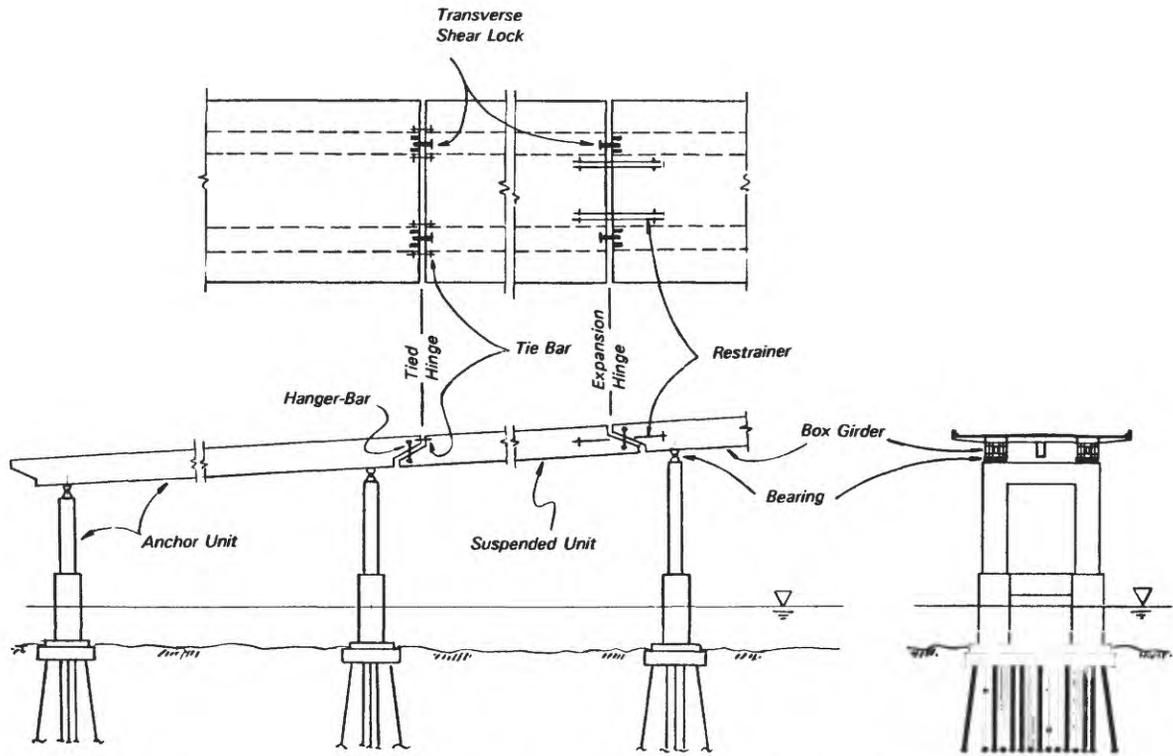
Steel bridge structural system at San Mateo-Hayward Bridge (courtesy of the Cygna Group).
